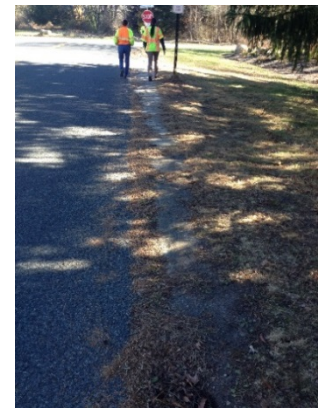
White's Woods Road looking northbound at intersection with South Lake Street and Russell Street
